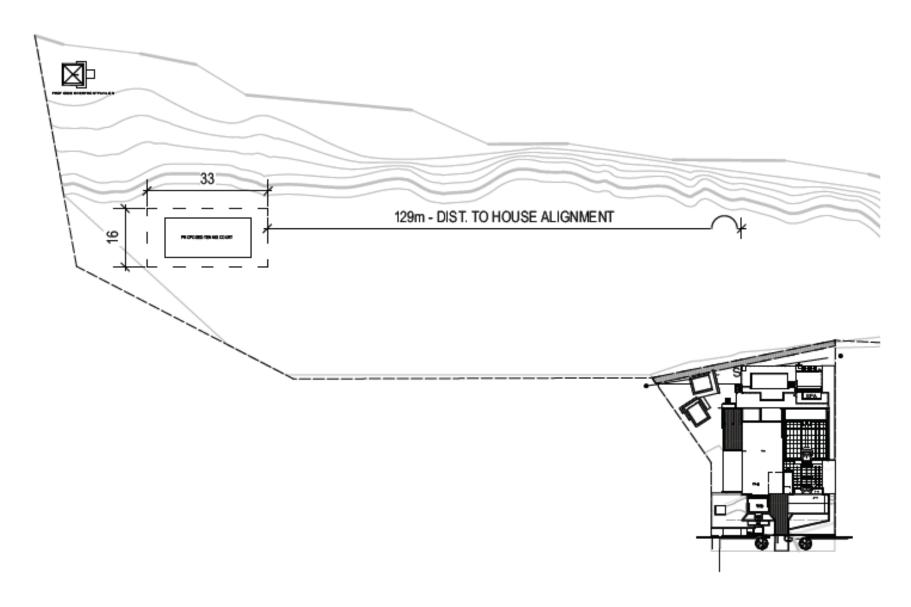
Proposed riverside pavilion and tennis court in relation to dwelling (Dirty Girl Designs, 2021)
